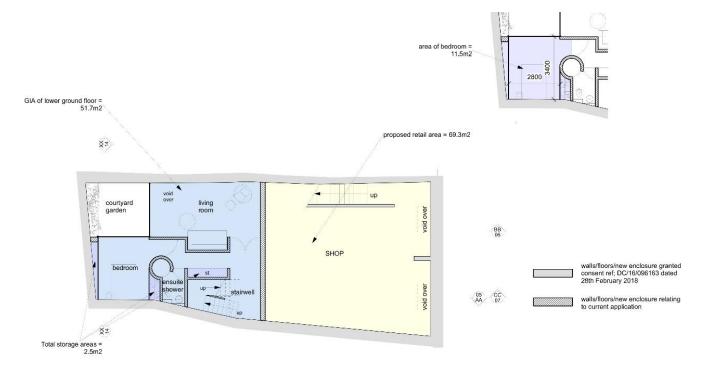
Plan of proposed basement extension (Tillman Architects, Dwg. No. 230-02-01 G, Jul 2015)
